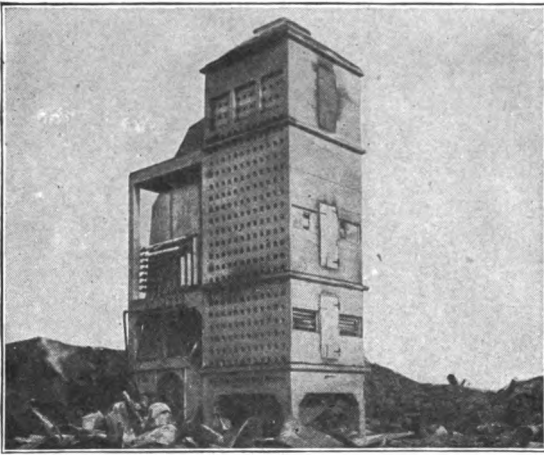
Same After the Fire. Reinforced Concrete Drier the Only Building Standing
